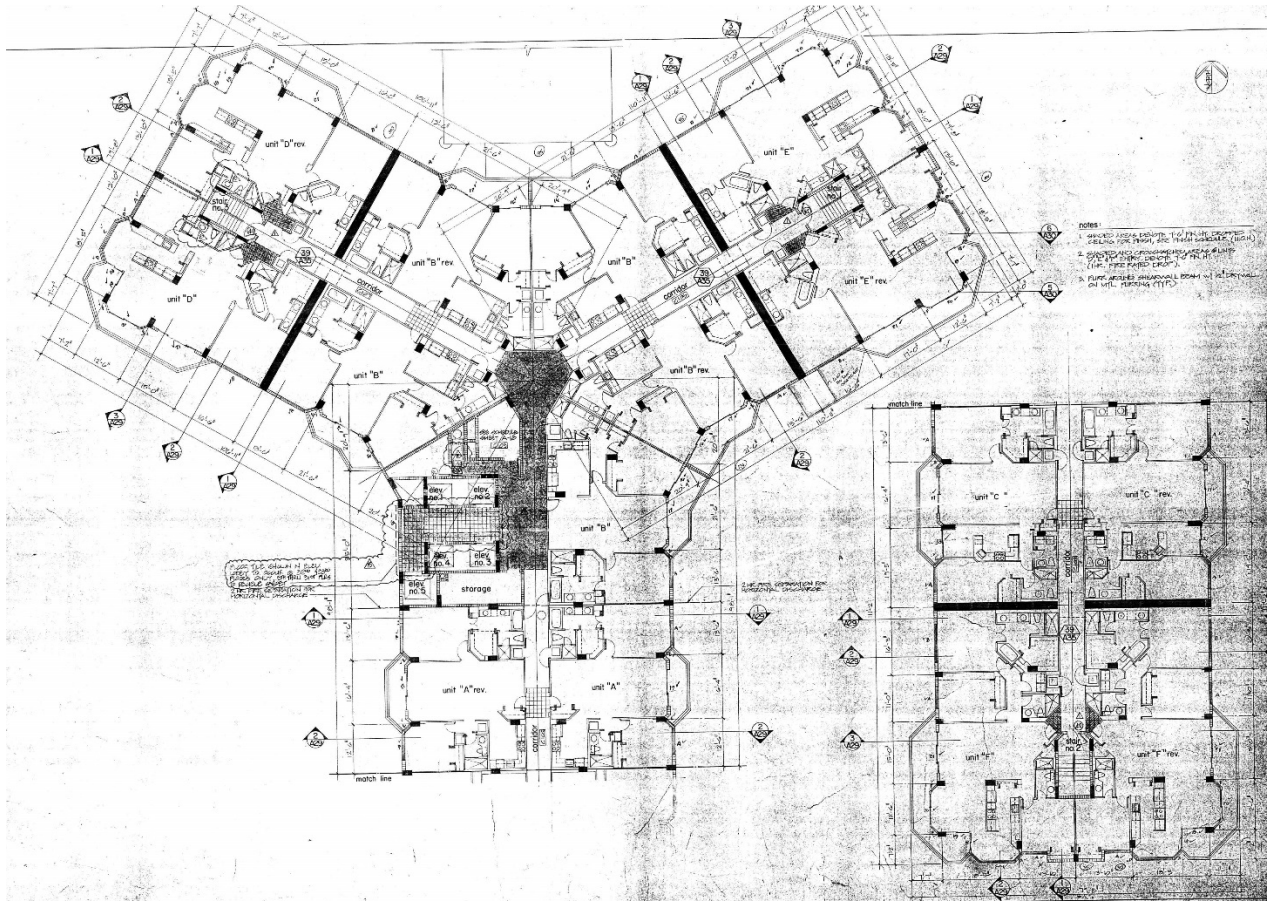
Typical Plan – Architectural Plans from The Sieger Architectural Partnership
